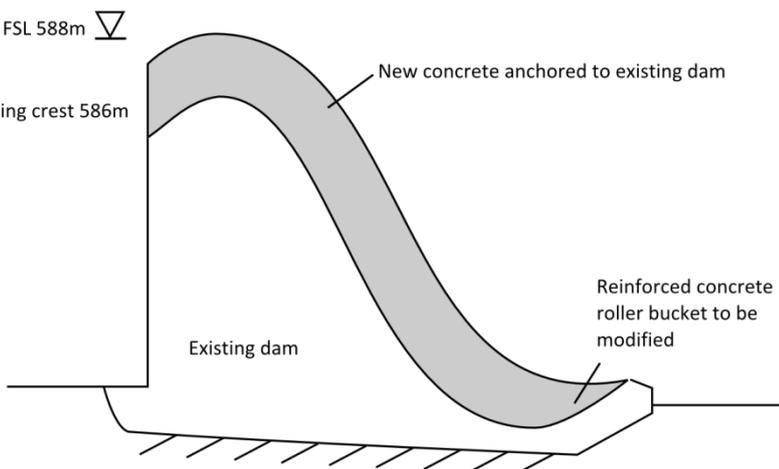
Raising abutment, saddle dam embankment and spillway for the Kidston Dam
